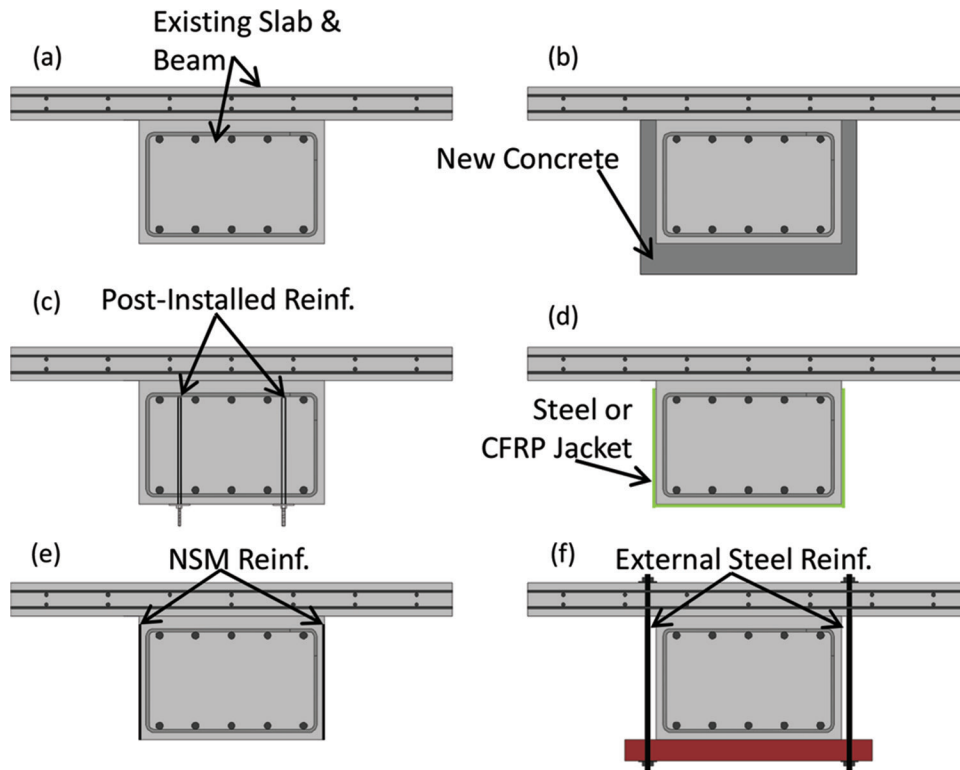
Shear strengthening methods for existing RC elements: (a) unreinforced section; (b) section enlargement by additional concrete and reinforcement; (c) post-installed, bonded, or unbonded reinforcement—steel or FRP; (d) external jacketing with CFRP or steel; (e) near-surface-mounted steel or CFRP rods or bars; and (f) addition of external reinforcement.
